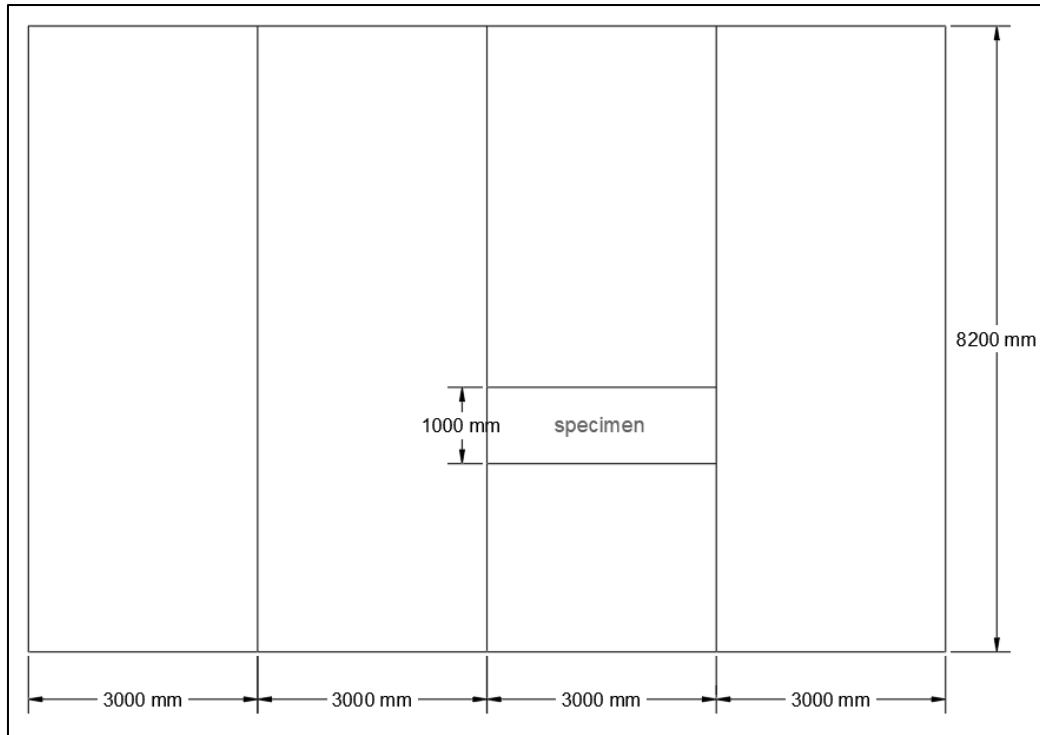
Prototype of Bridge Deck Slab System and Selected Specimen
